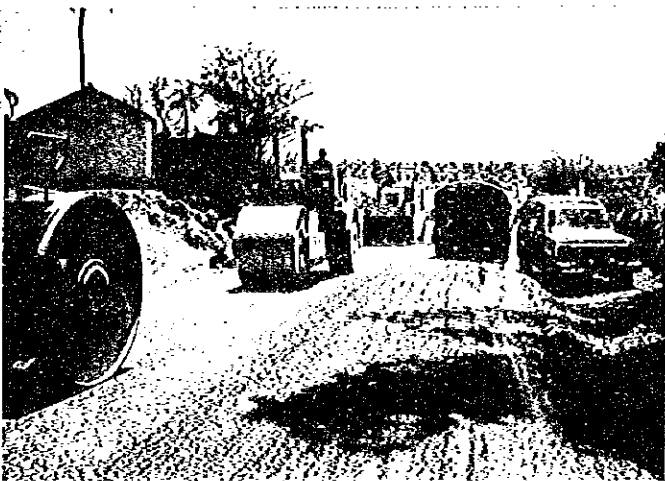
Pilot Project, Improvement of the Vingunguti Disposal Site (2)
